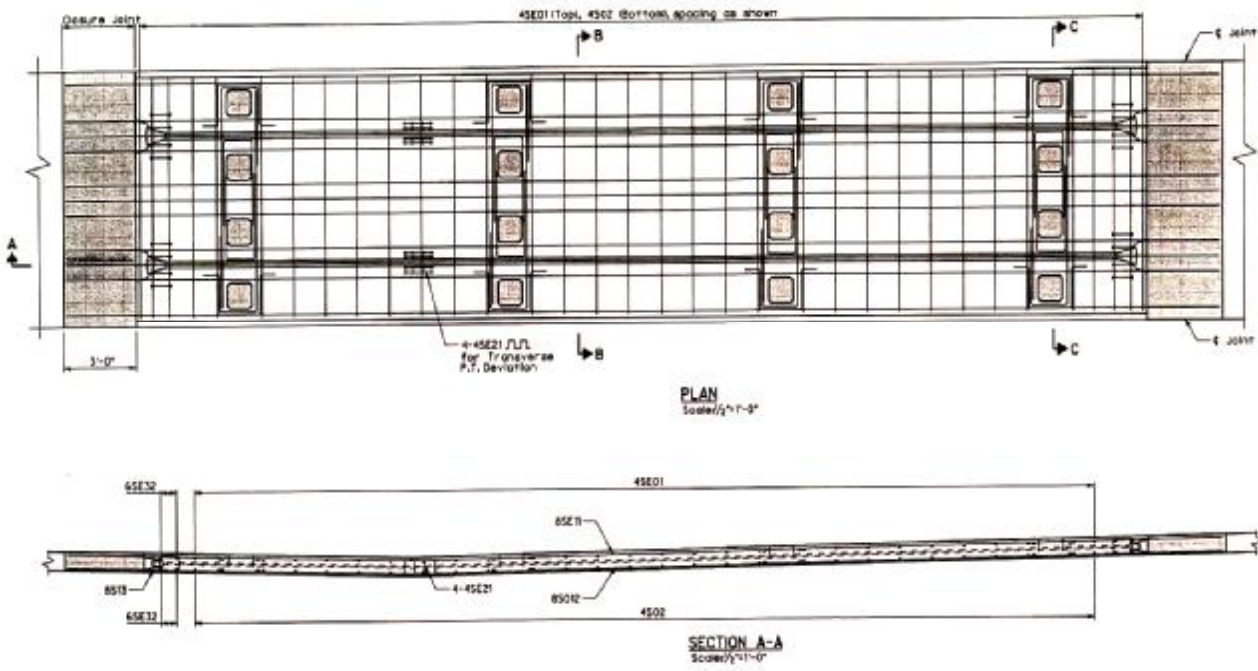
Details of Stage 2 of the precast panels
